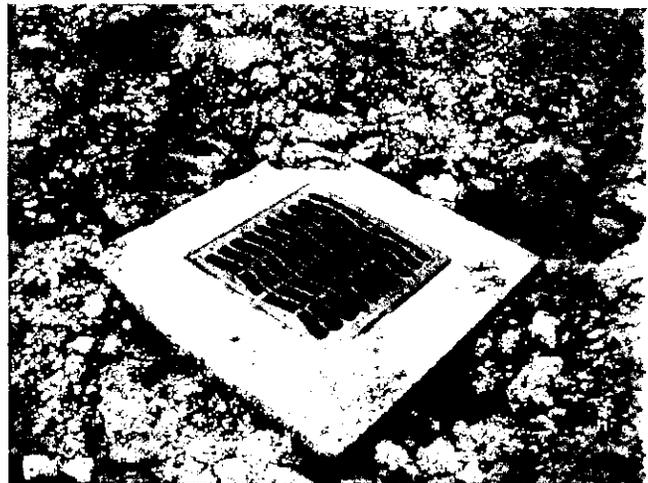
Inlet protection is needed around the outlet structure of the sediment pond.
